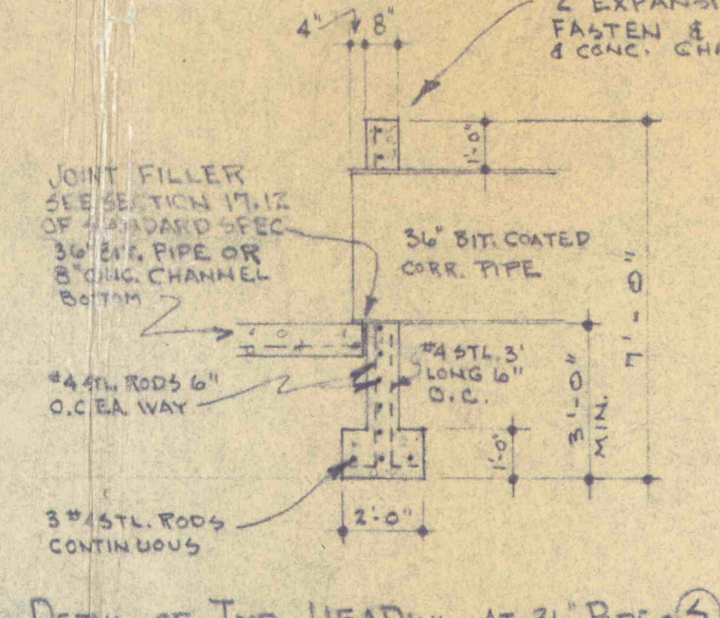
" PIPE ON DITCH "B" & "E" - (Q)
